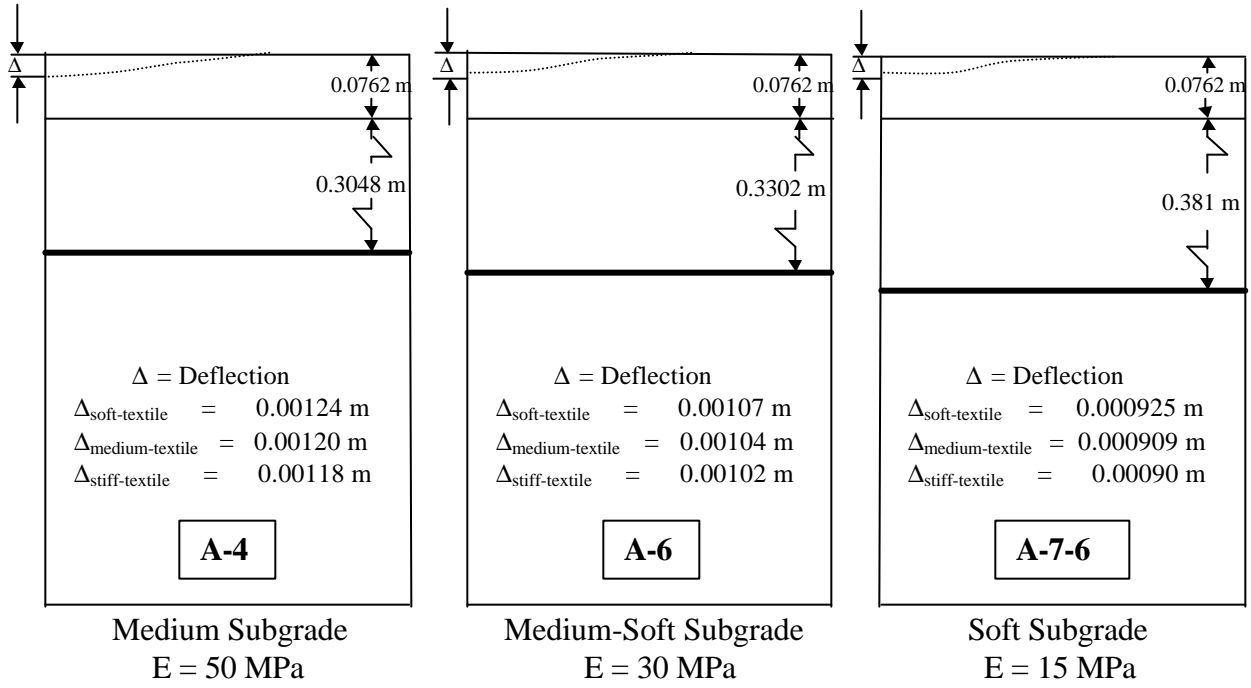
Road cross-sections and deflections for 300-600 HCADT structure, surfaced, -20° C
